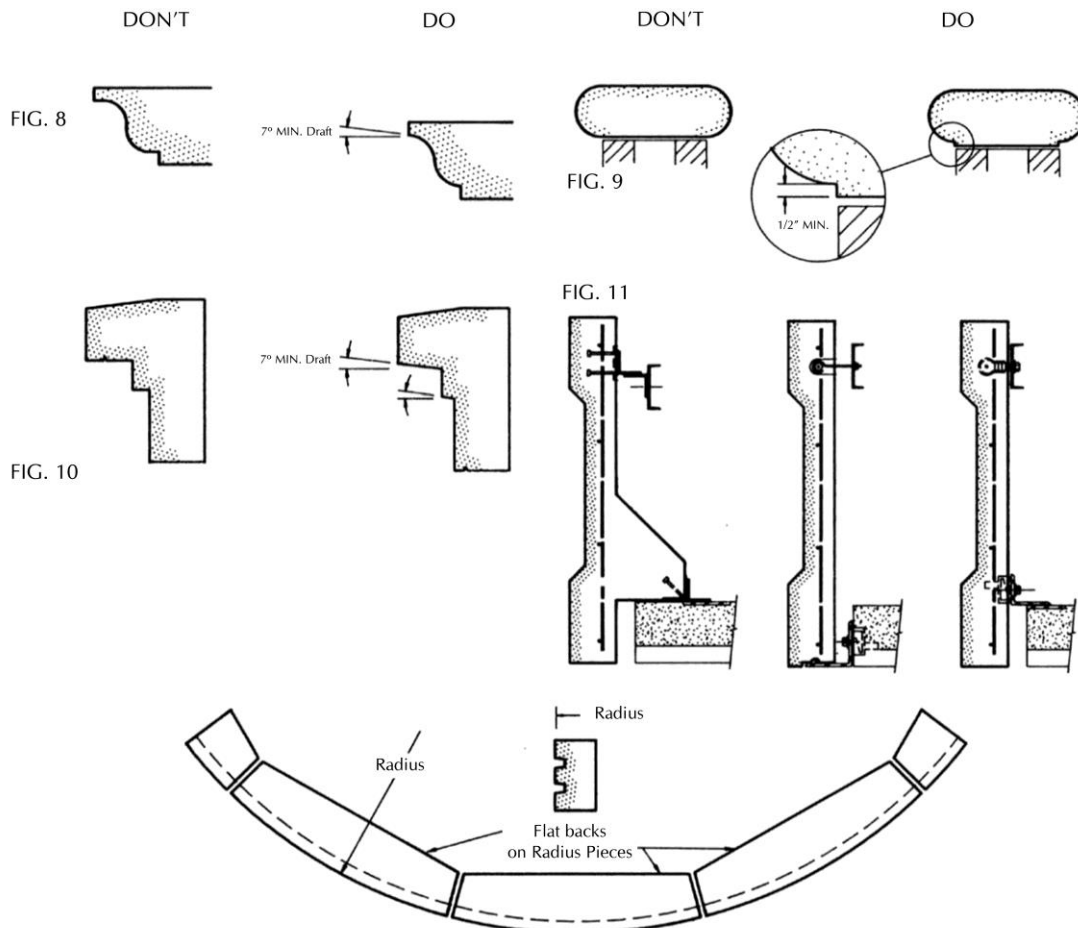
Projecting portions of sections, in general, should not exceed their thickness. A 7 to 9 degree draft is usually needed to separate the production pieces from the mould and may be provided by the manufacturer even where 90 degrees is shown on the drawings.
